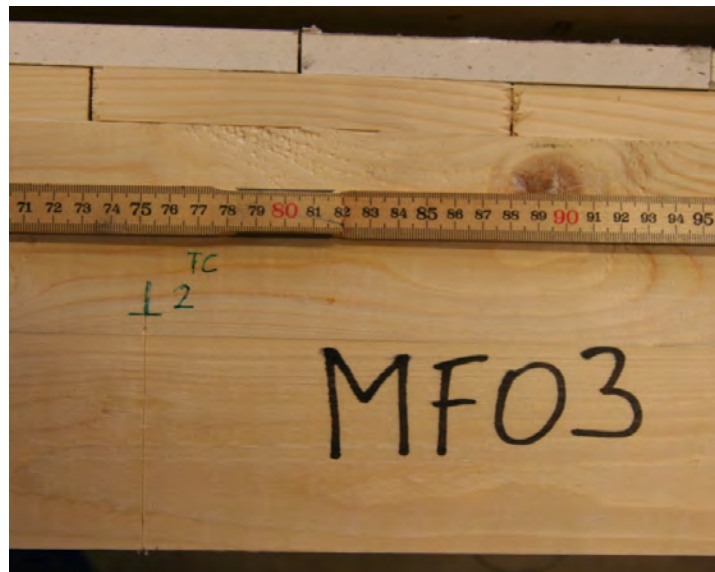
Detail of the side protection and beam from the bottom view of specimen MF03
